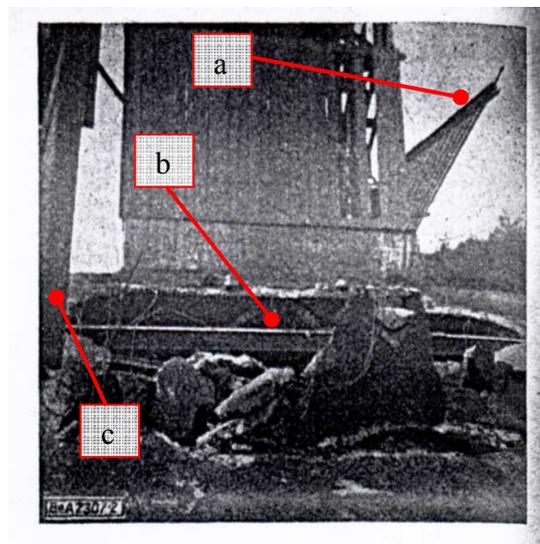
Photo taken from the roof of #2 Shaft House, facing southwest. Legend: a) hoist frame with at least one side (north) of the wooden cladding blown out; b) hole in the concrete roof where the gas jet exited into the open air; c) possibly part of the inclined back leg, (photo from Jung-hans 1953b)
